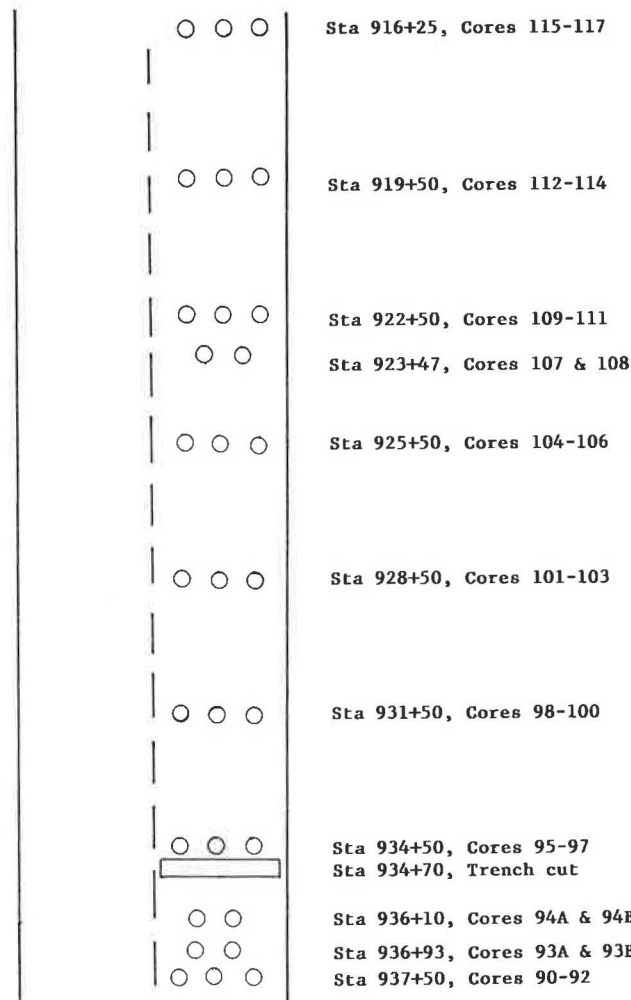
Layout of test section—northbound lanes of I-55 near Collinsville, Ill.
